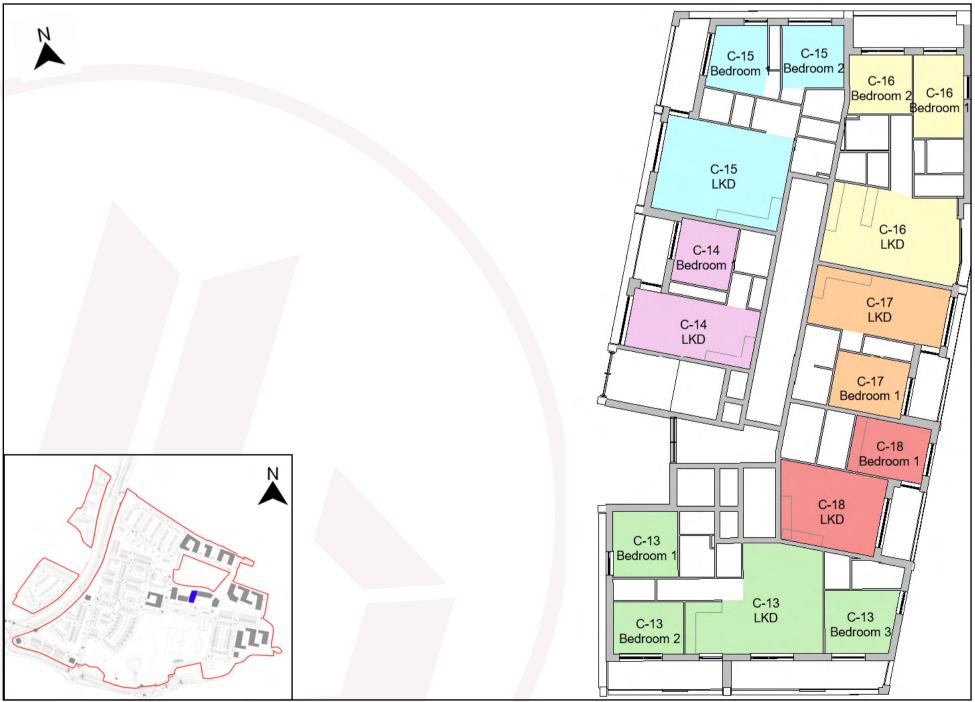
Keyplan highlighting the assessed building (L), Floor plan of assessed building (R).
